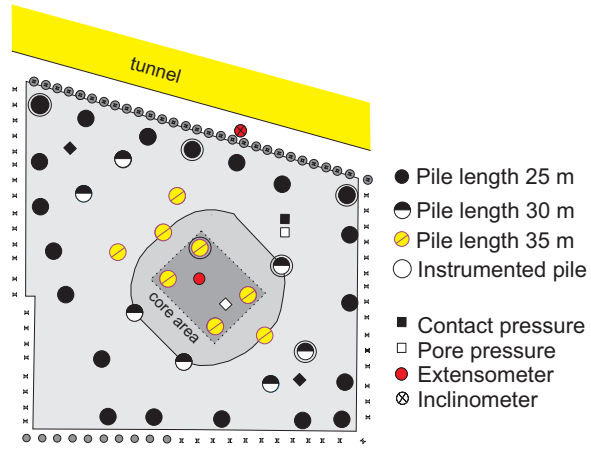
Ground plan CITY-TOWER including geotechnical measurement devices.
